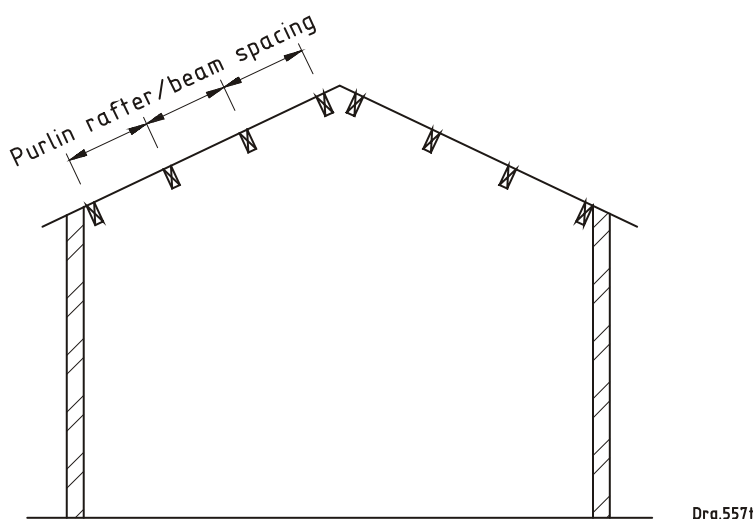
Typical arrangement of purlin rafter/purlin beam construction
